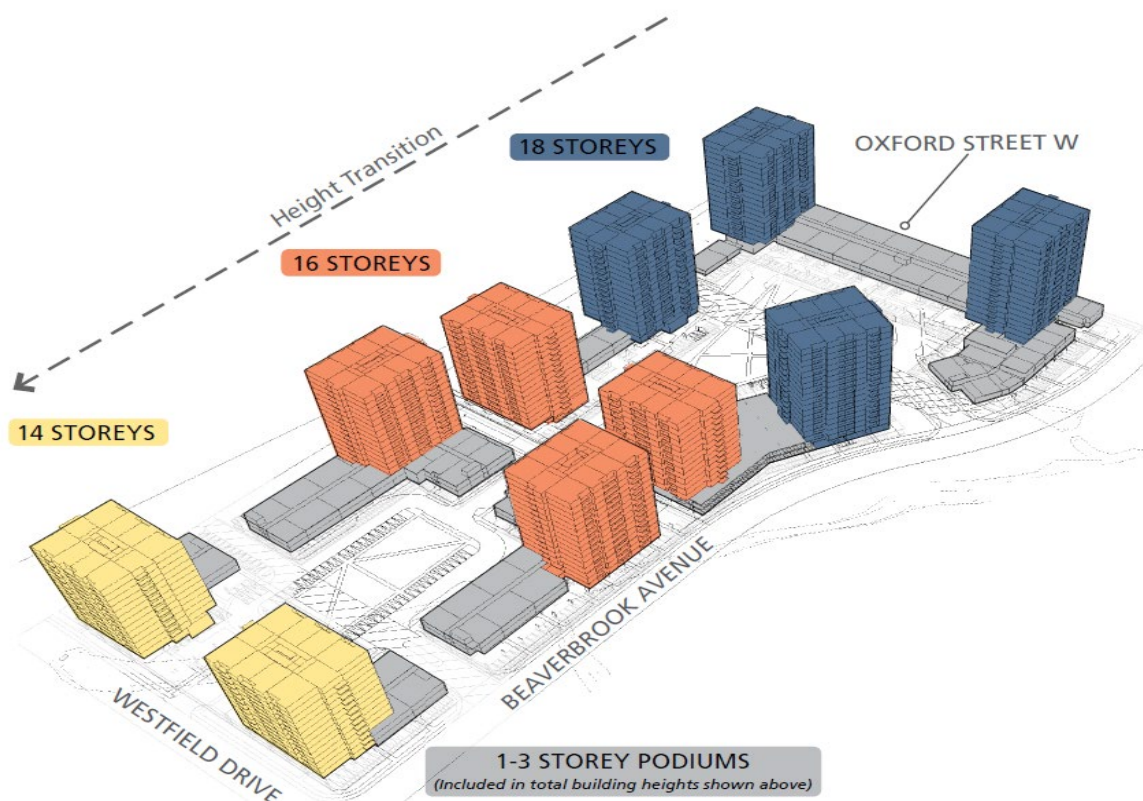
Block 1 Height Transition and Massing Fronting Oxford Street West
